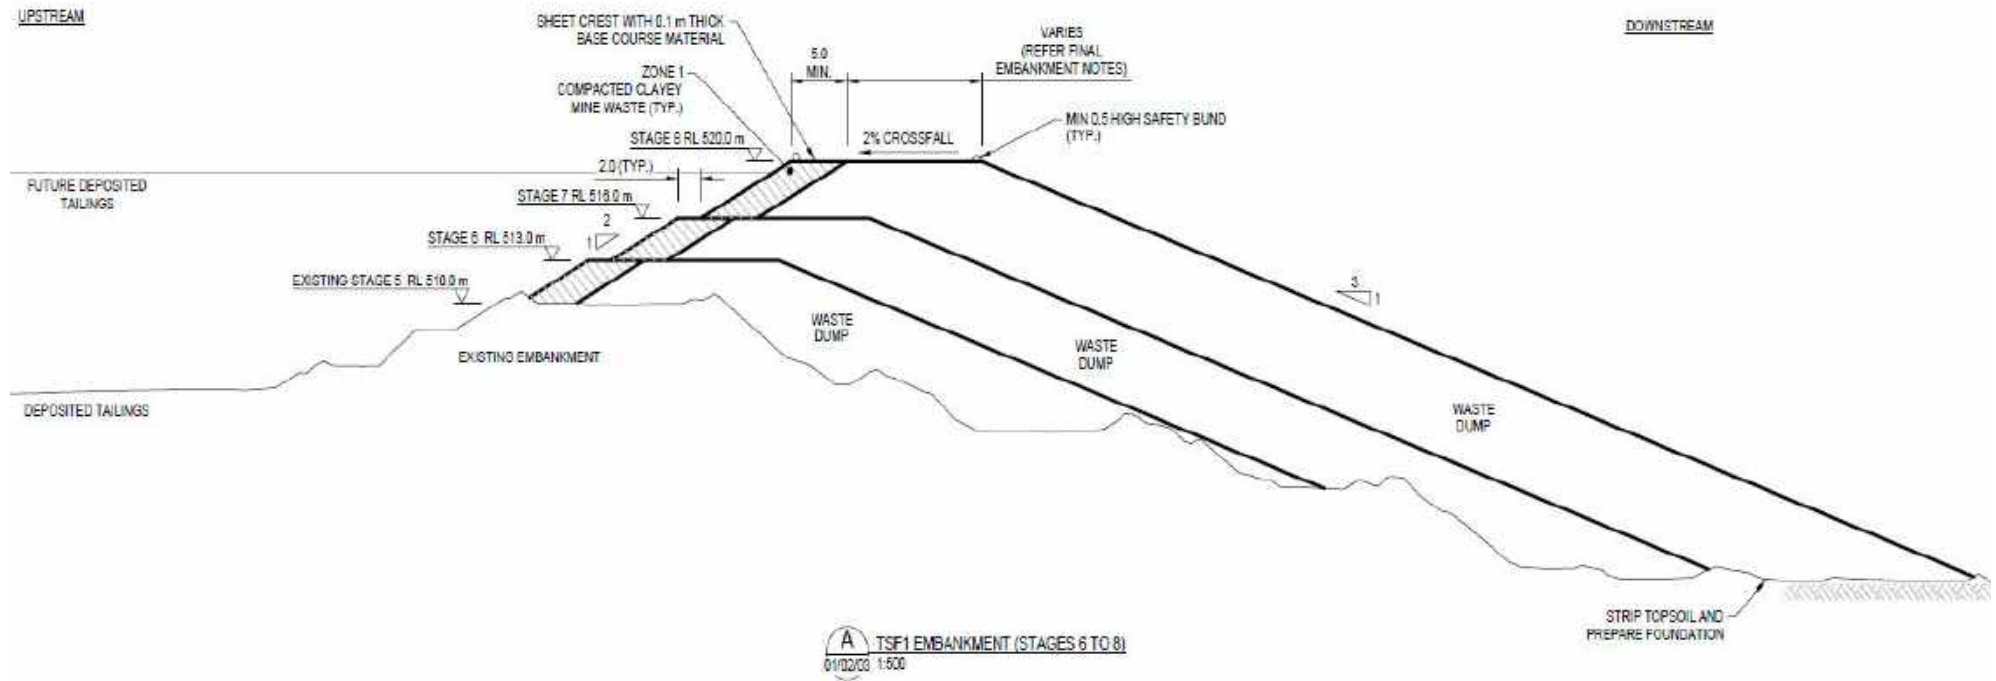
IWL TSF Stage 6-8 Design Cross-Section
